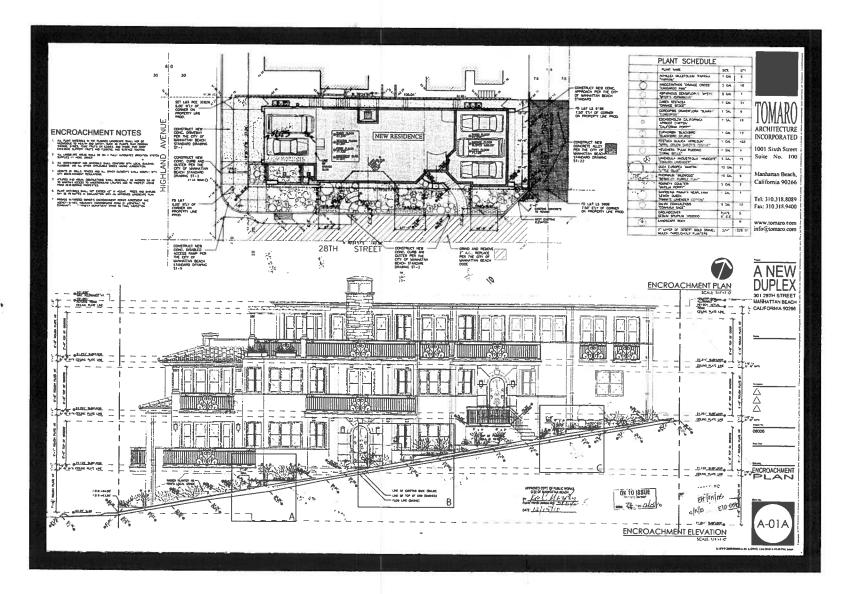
EXHIBIT H - DECEMBER 15, 2010 APPROVED PLANS CONTINUED
